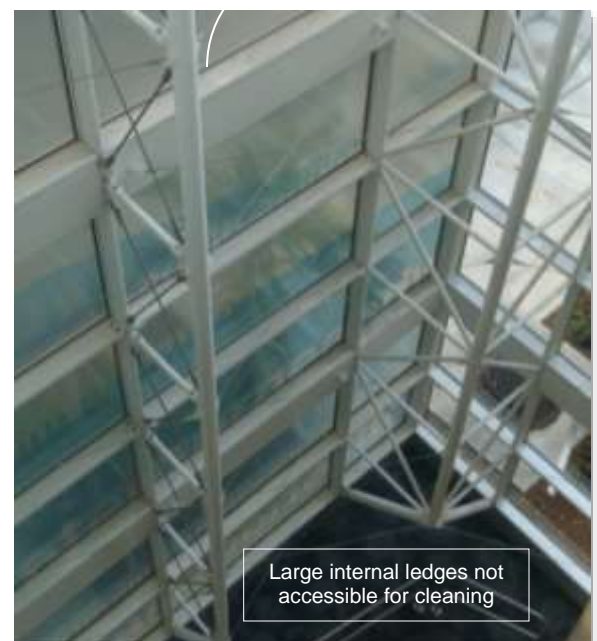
Provide Unobstructed Floor Area for Maintenance and Cleaning of Curtain Wall Framing.
